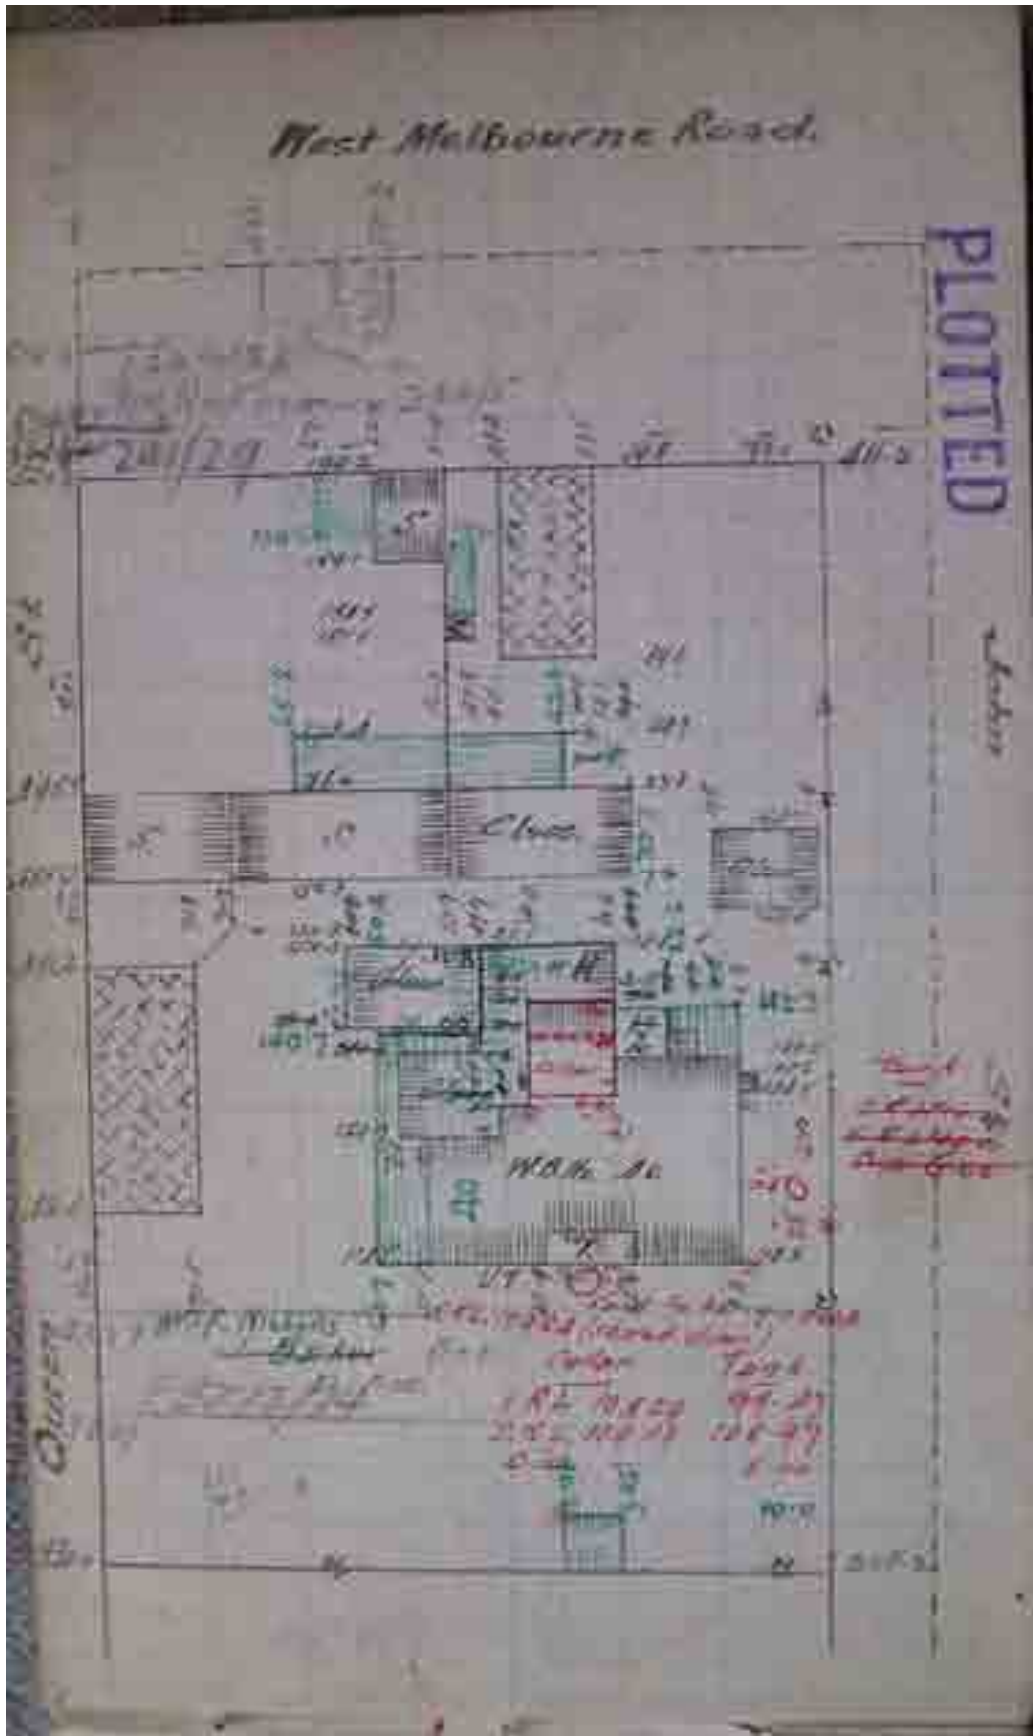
GWST Fieldbook plan showing layout and extent of Baker's property in c.1912 & c.1914, when owned by Mrs F. Nicholls. Source: GWST Fieldbook, no. 125, p.1, Barwon Water Collection.
